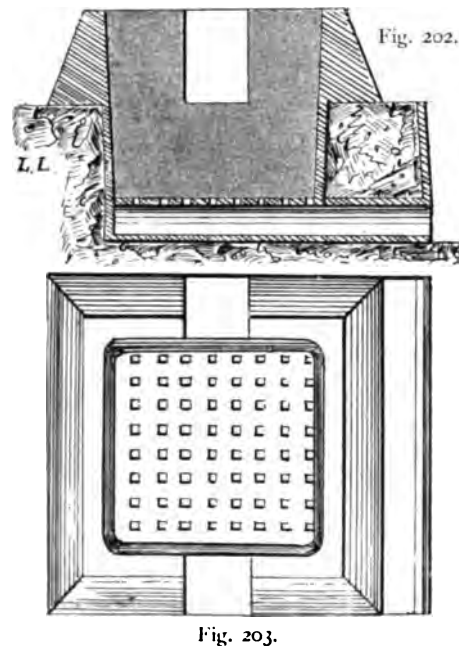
Longitudinal Section. Fig. 203.—Plan.
